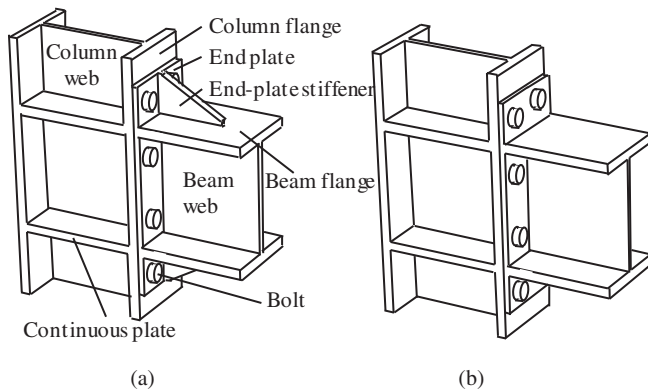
Conventional configurations of extended end-plate joints: (a) with end-plate stiffeners; (b) without end-plate stiffeners.
